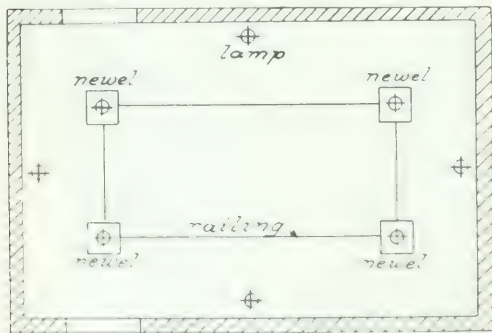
PLAN VIEW OF OFFICE ROOM.
